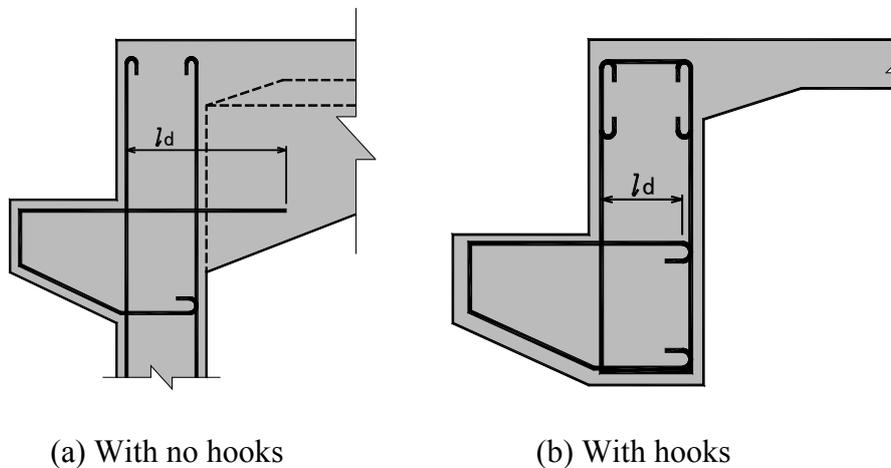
Anchorage of primary reinforcement in column to underground beam<sup>1)</sup>
